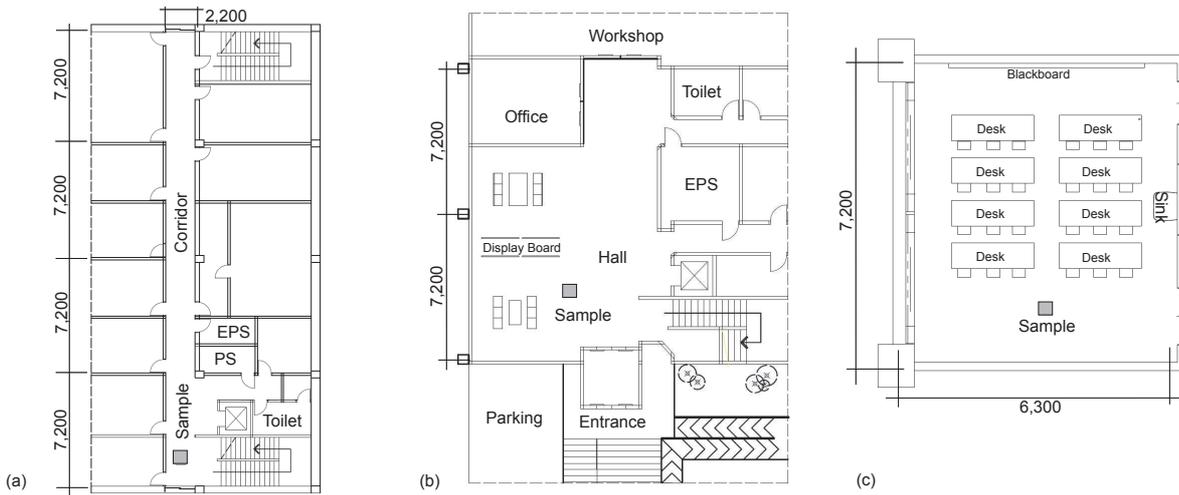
Plan views of furniture layouts and material locations: (a) a corridor; (b) an entrance hall; (c) a seminar room.
